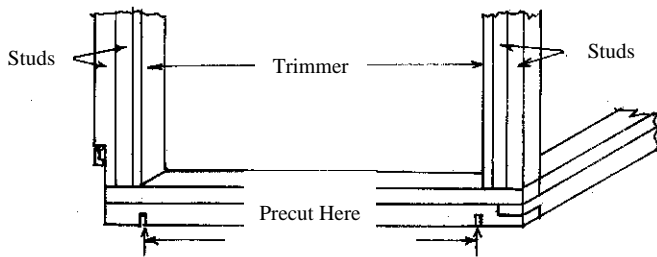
Precuts in the bottom plate to help prevent marring the finished floor during installation
